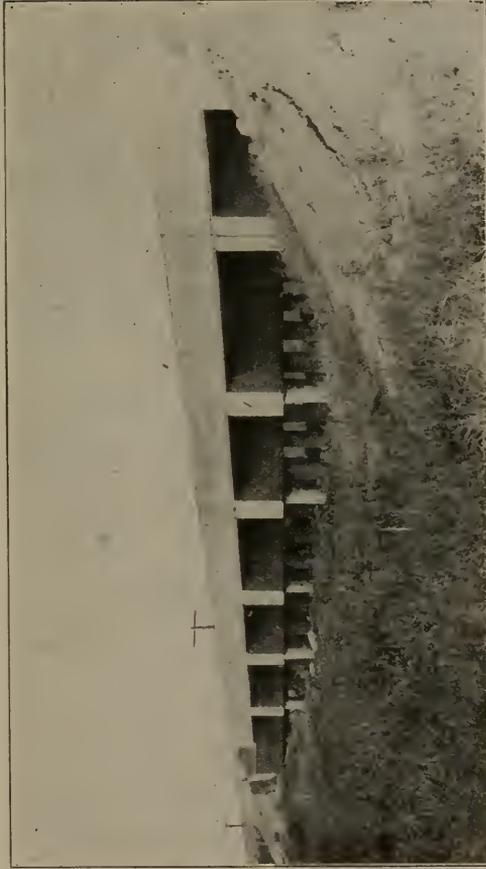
REINFORCED CONCRETE TRESTLE—CHICAGO, BURLINGTON & QUINCY RAILROAD.
